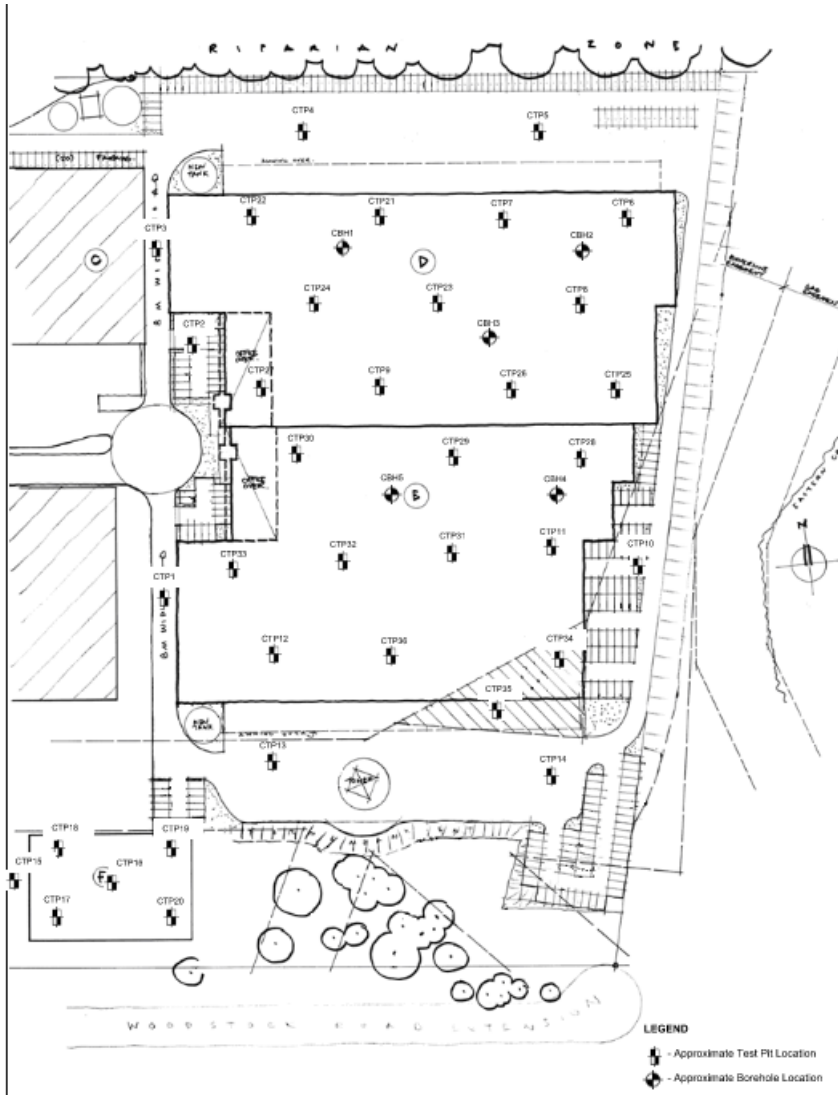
Geotechnical Testing Locations – Coffey, 2008
